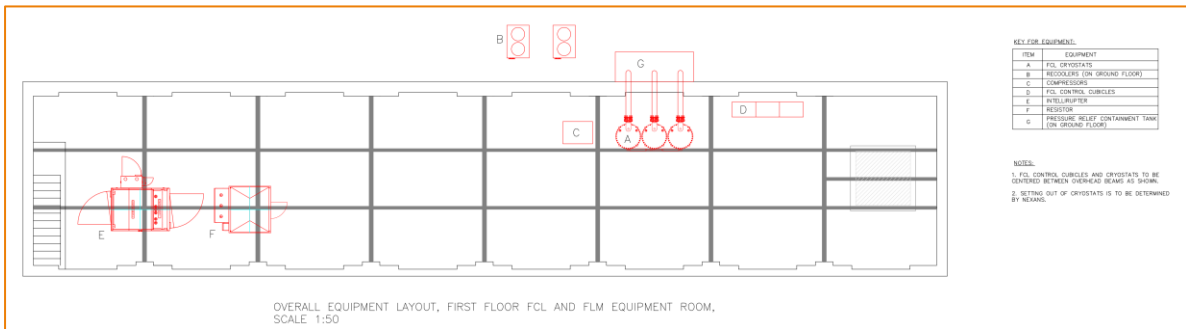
Initial layout of new equipment for Bournville (FCL equipment A – D)
